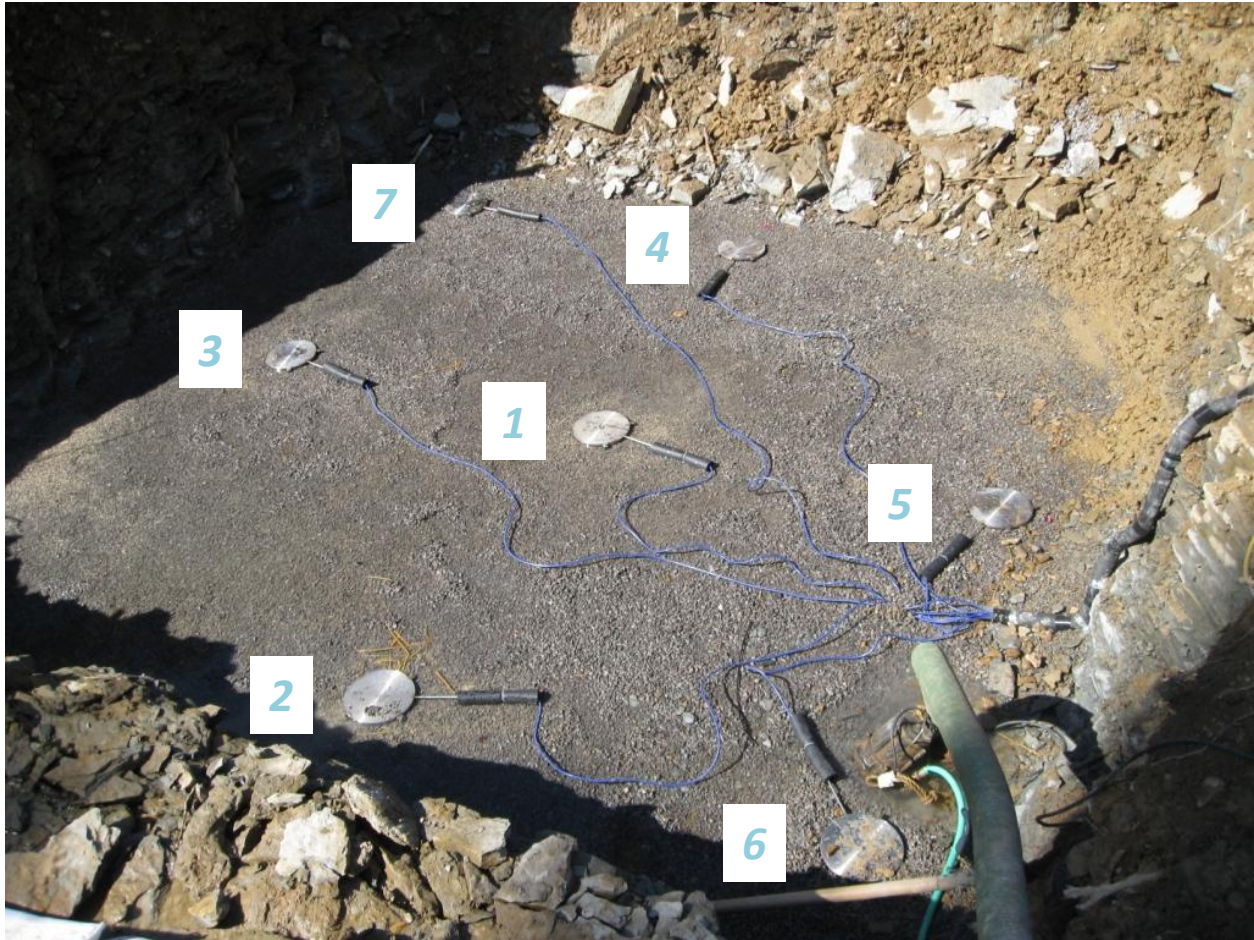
Pressure cell layout beneath the southernmost footing of Pier 1 (picture taken prior to pouring of footing concrete).
